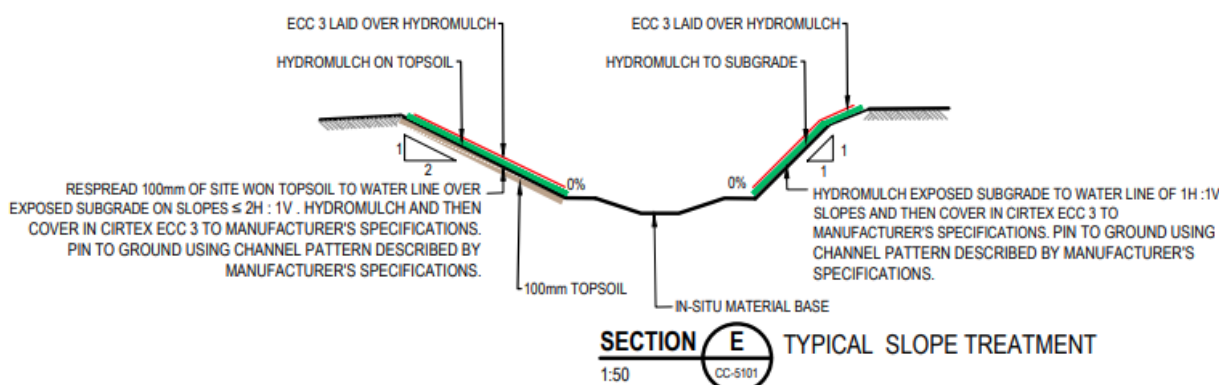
Typical Cross Section – Leeston Creek Upgrade.
